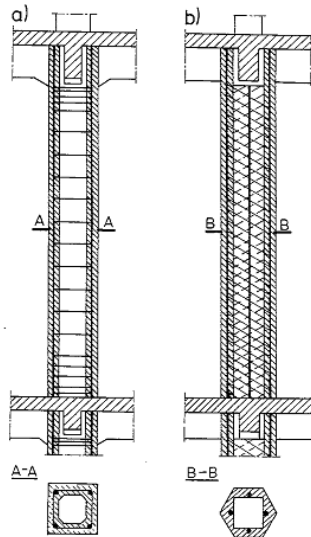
Concrete columns strengthened with concrete jacketing [19].
